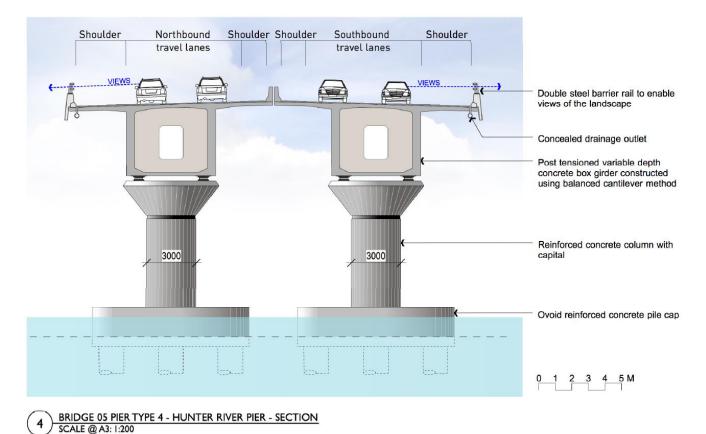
Indicative drawing of box girder bridge structure (B05)
